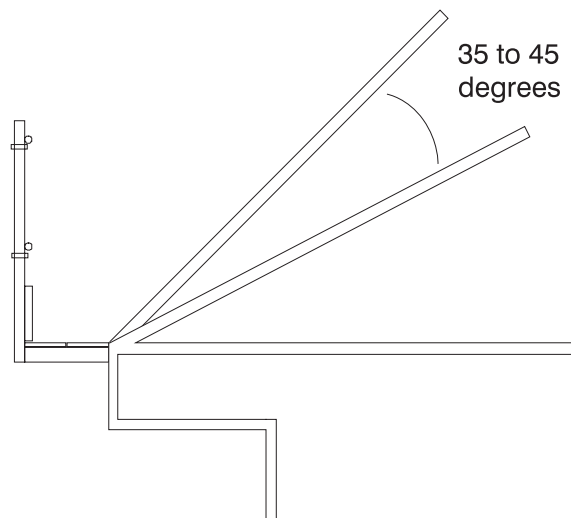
A roof with a slope greater than 35° and up to 45° with a guardrail system requires a two-plank platform.
